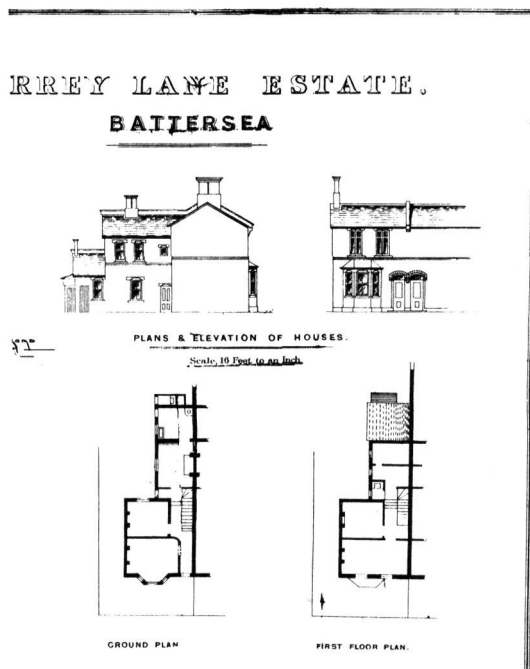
Estate Development: Surrey Lane Estate, plan and elevation, 1877.
